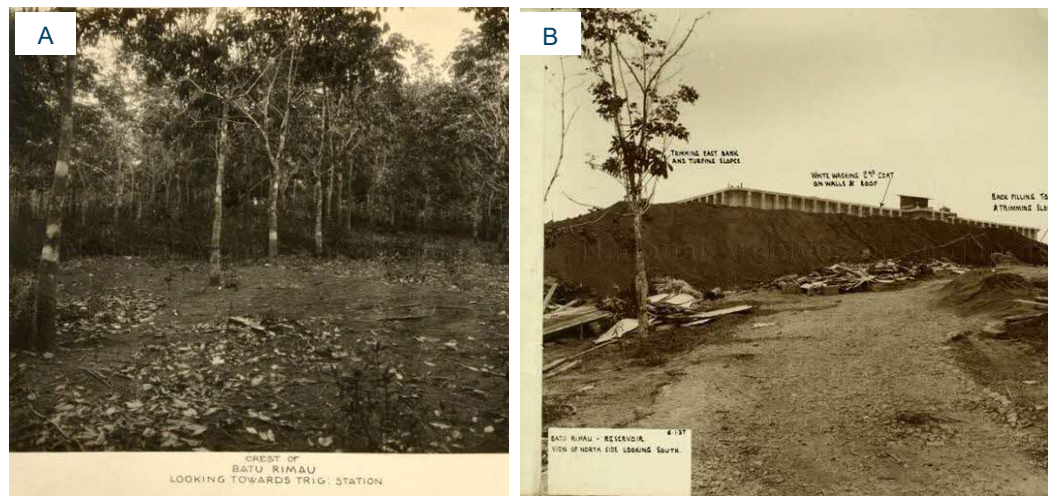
(A) Rubber plantations in the Batu Rimau area in 1923. (B) Reinforced concrete reservoir located in the British Army Base of Batu Rimau. (National Archives of Singapore, 2023).
